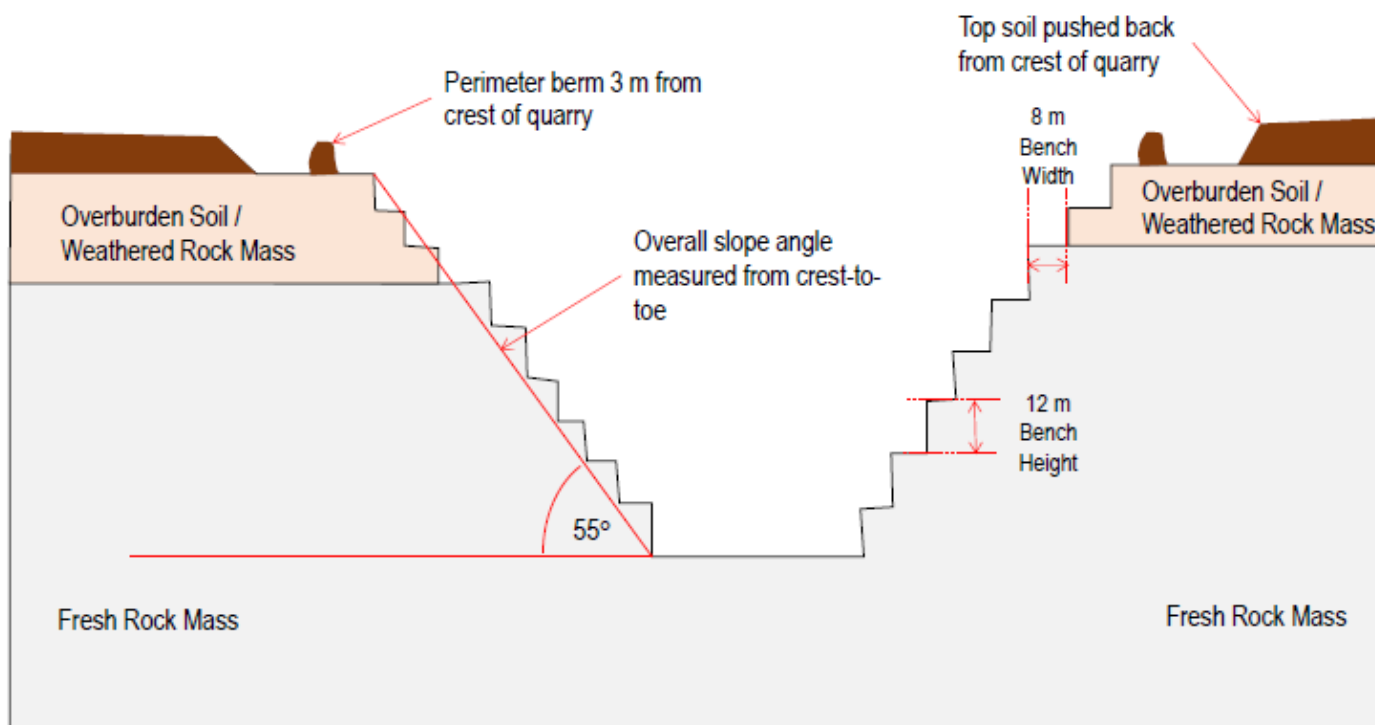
Schematic representation showing the slope design parameters recommended for Wansley Quarry (image obtained from the Mine Plan)
